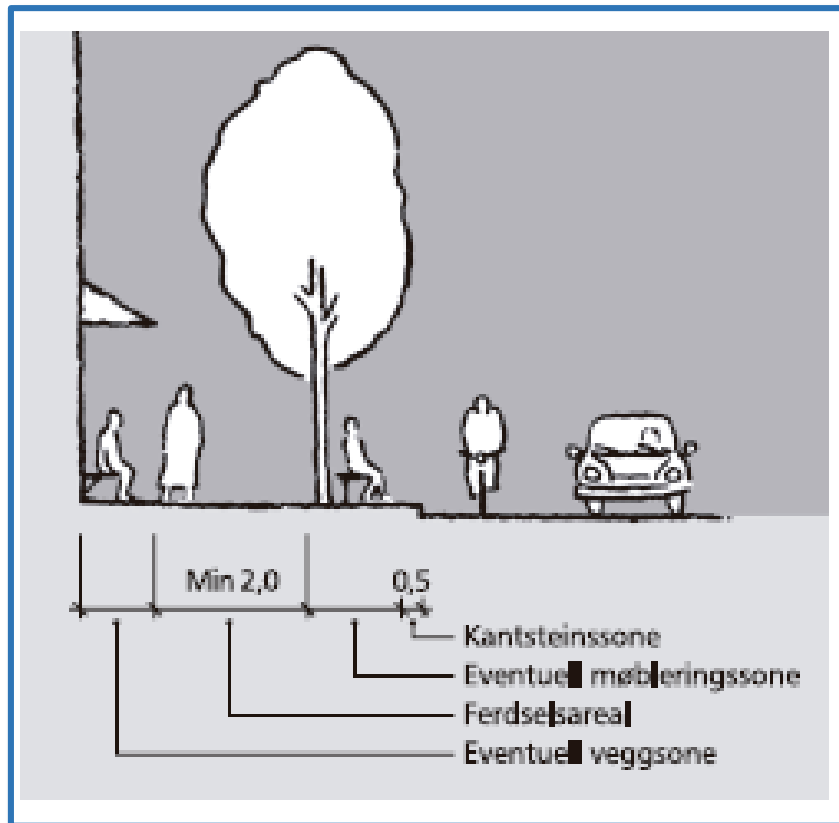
Street cross section (Statens and Vegdirektoratet, 2014)
